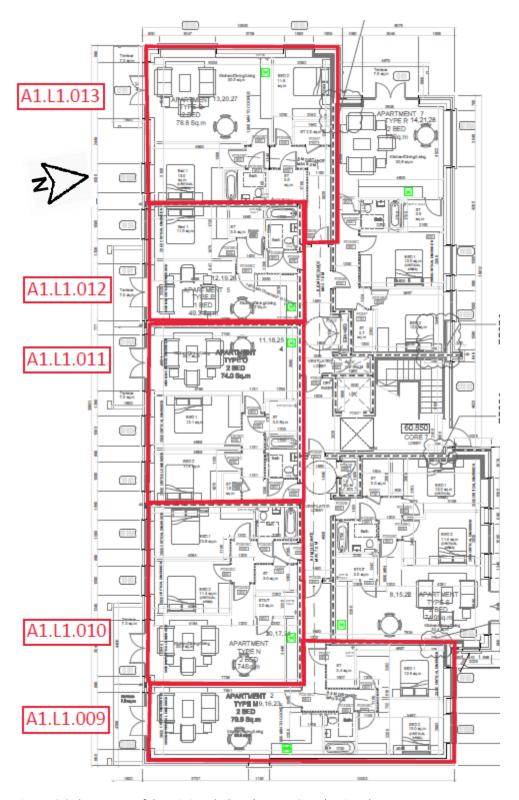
Floor Layout of the Existing Block A1 (Pappan Grove) – First Floor
